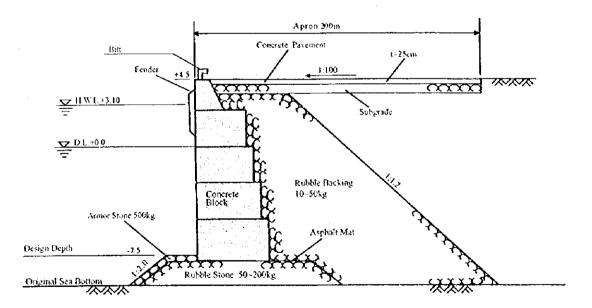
Concrete Block Type Passenger Berth (-7.5m)
